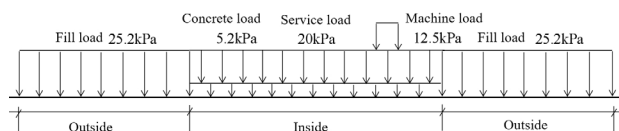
Schematic diagram of foundation action load of hydraulic test hall
